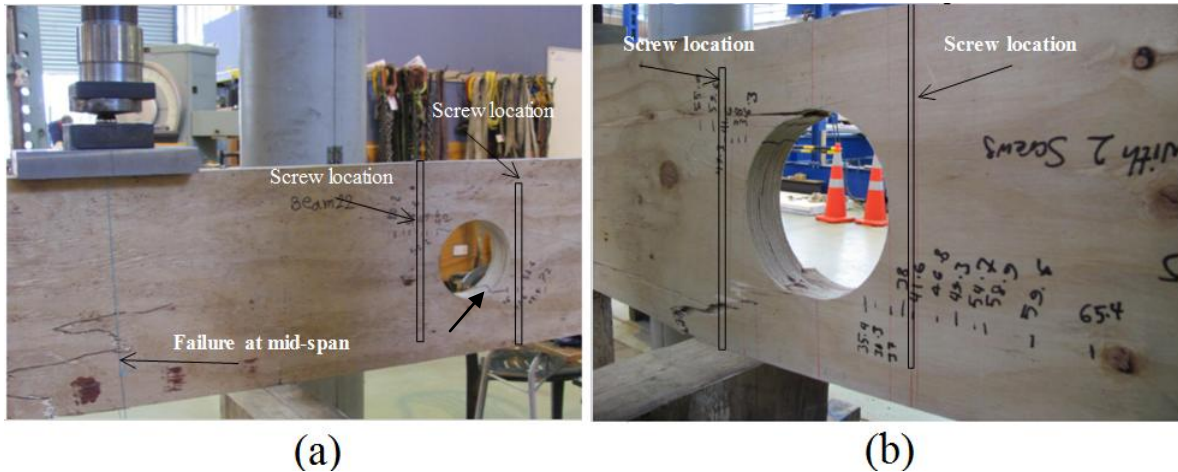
Different failure mechanisms in beams with holes: (a) mid span failure, (b) failure at hole edge
